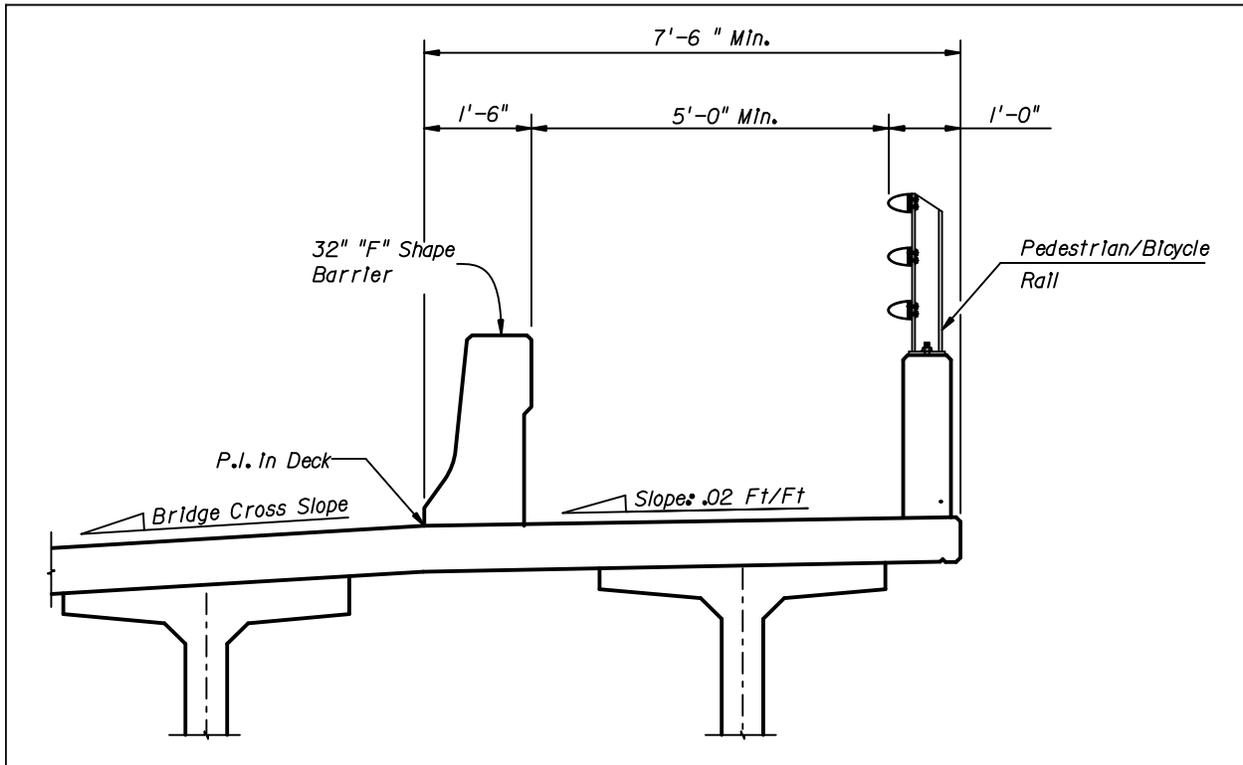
Section at Sidewalk With Bridge Cross Slope Greater Than 2% (2 of 3)
